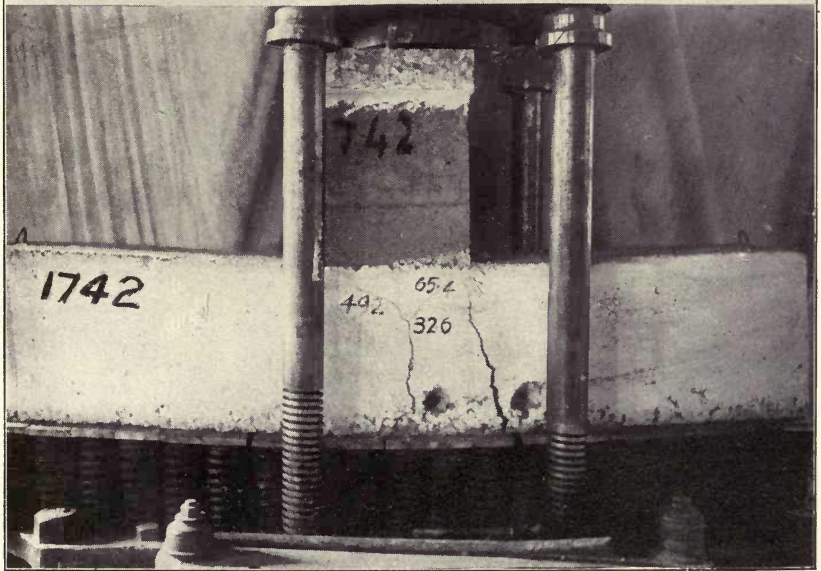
VIEWS OF REINFORCED CONCRETE WALL FOOTINGS AFTER TEST.
